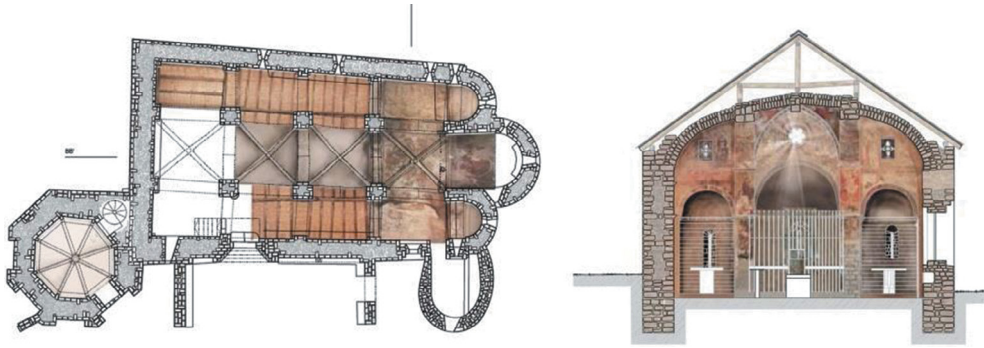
Plan and section of Sant Andreu of Salardú [12].
